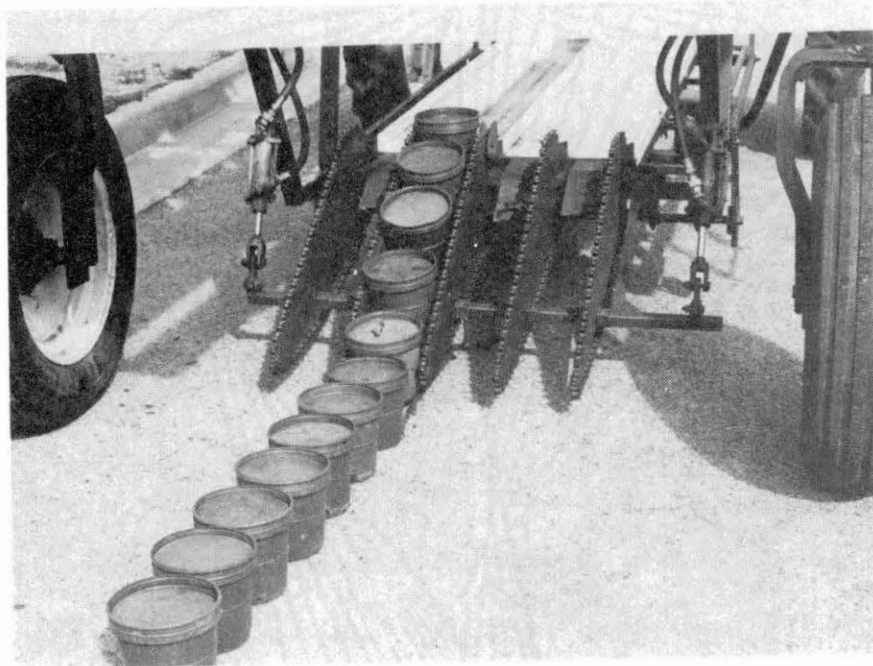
Front View of Header During Edge to Edge Loading Sequence Showing Headers, Pallet and Support and Lower Portion of Hagee
